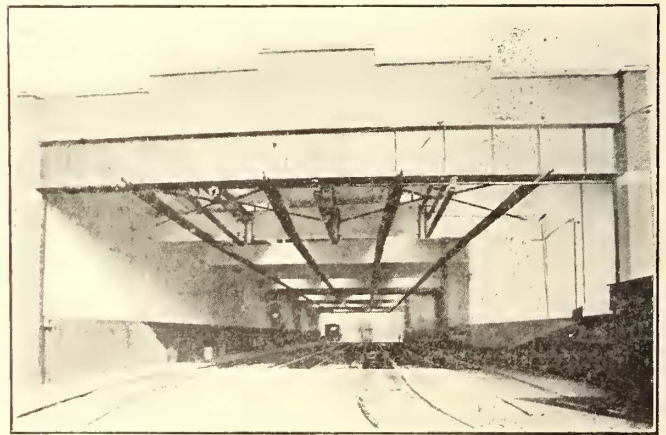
Buildings and Structures—Carhouse of Mill Type Construction
